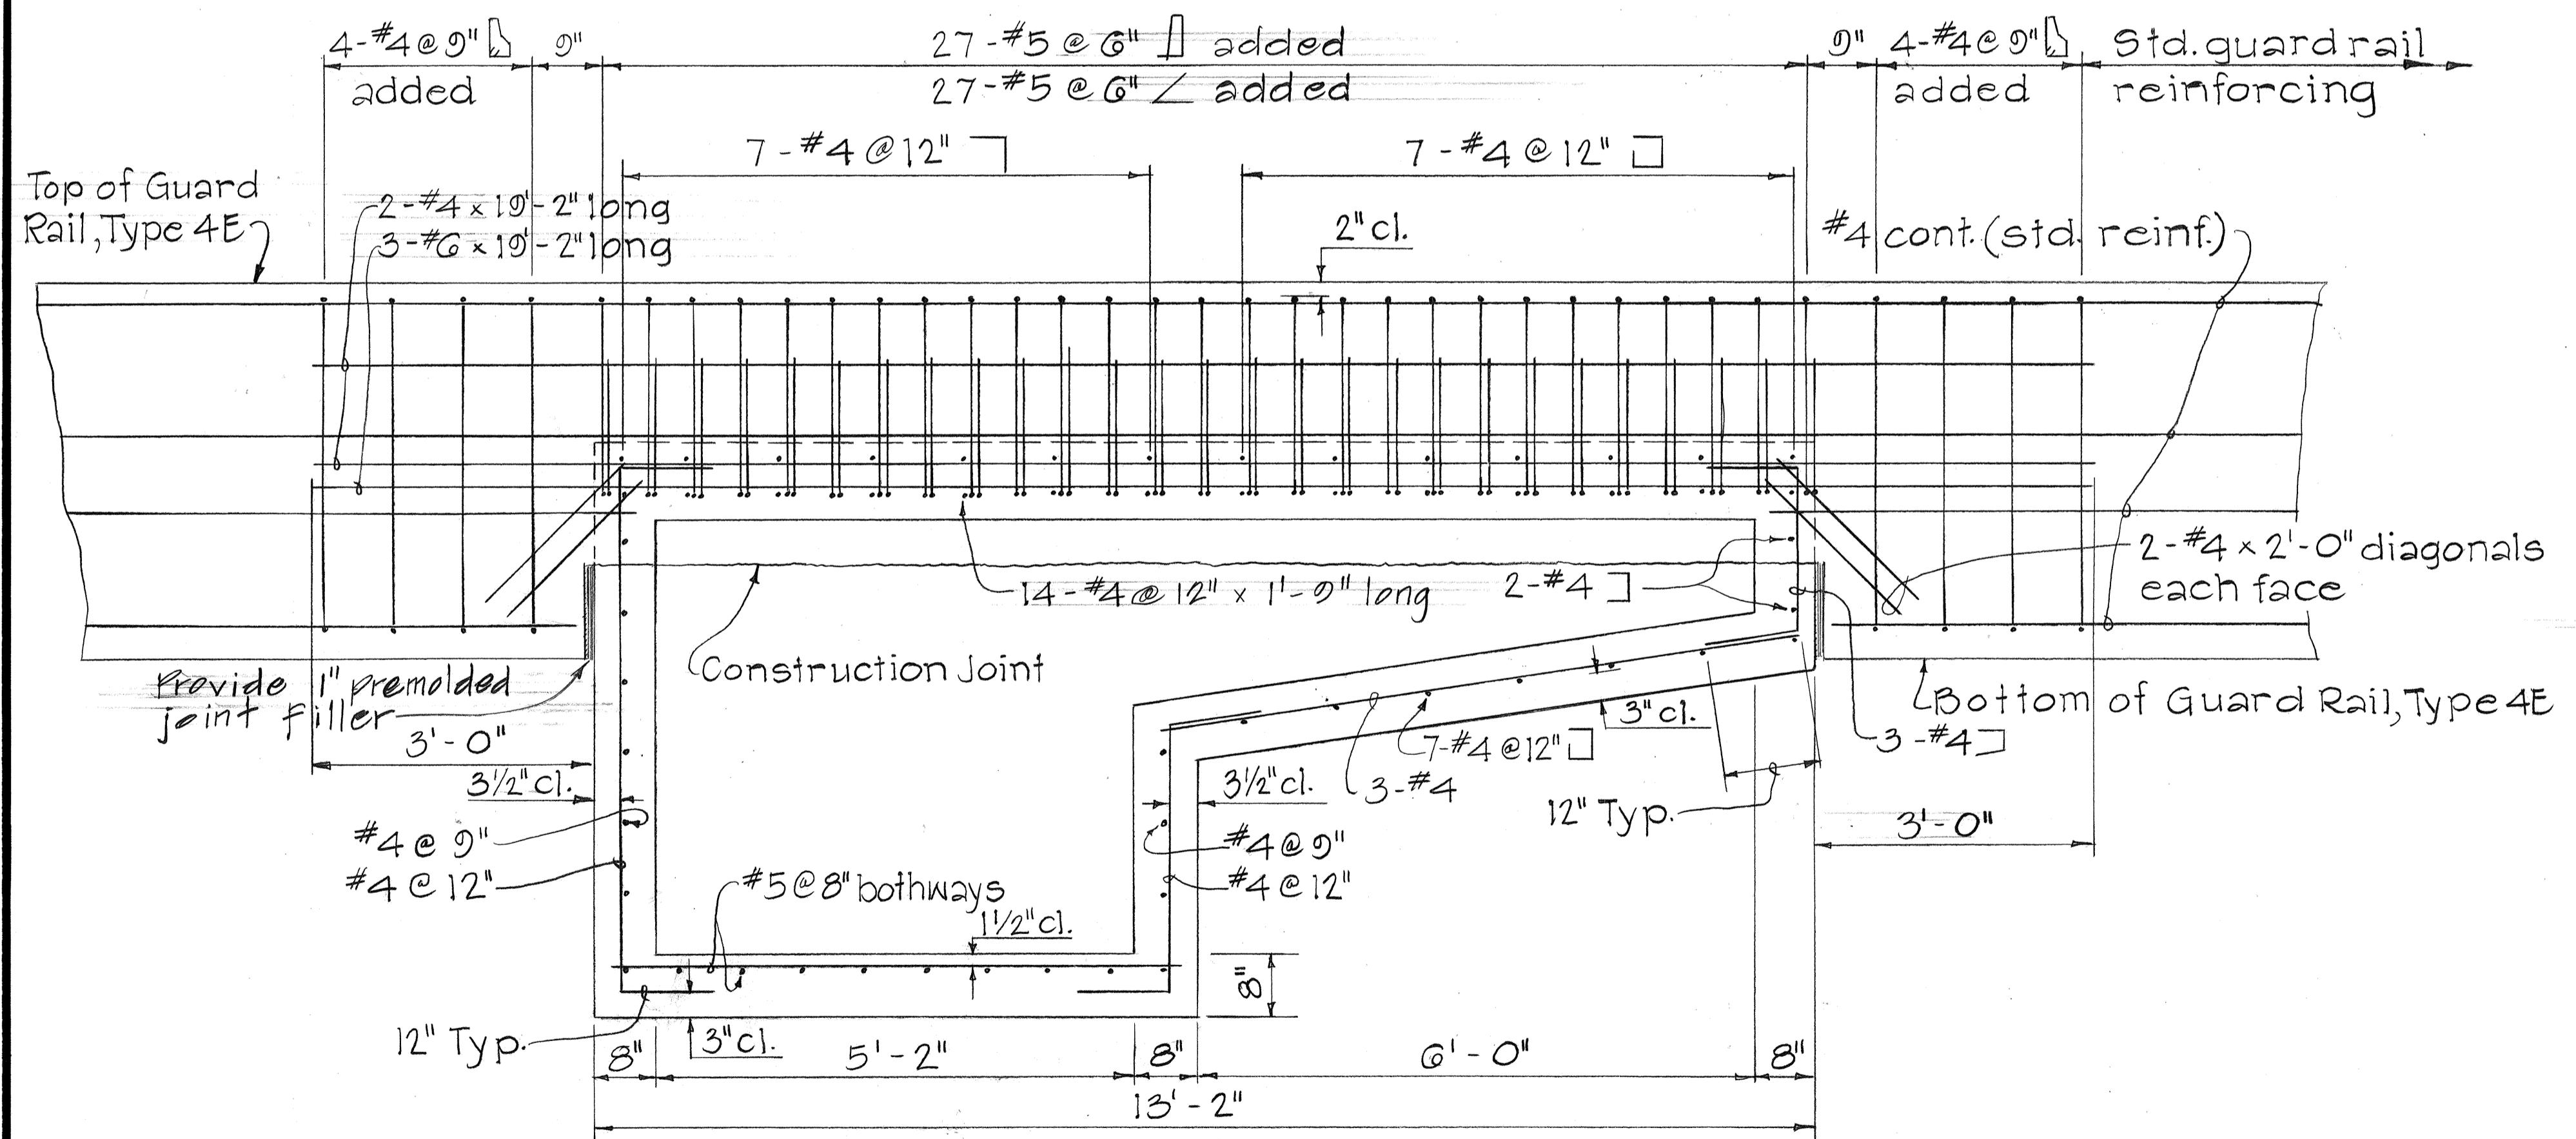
DETAILS OF MODIFIED TYPE "C" CATCH BASIN AT RAMP K-4 STA. 9+14
